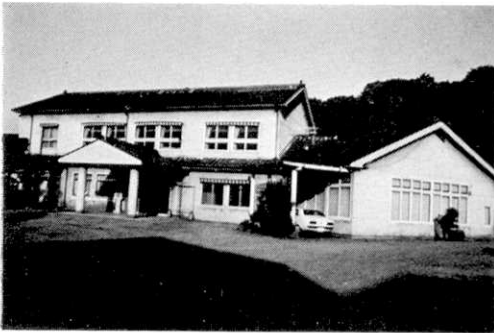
Damage to the tile roof of a hotel (Sanbe Kanko Hotel) at the Sanbe hot-spring.
